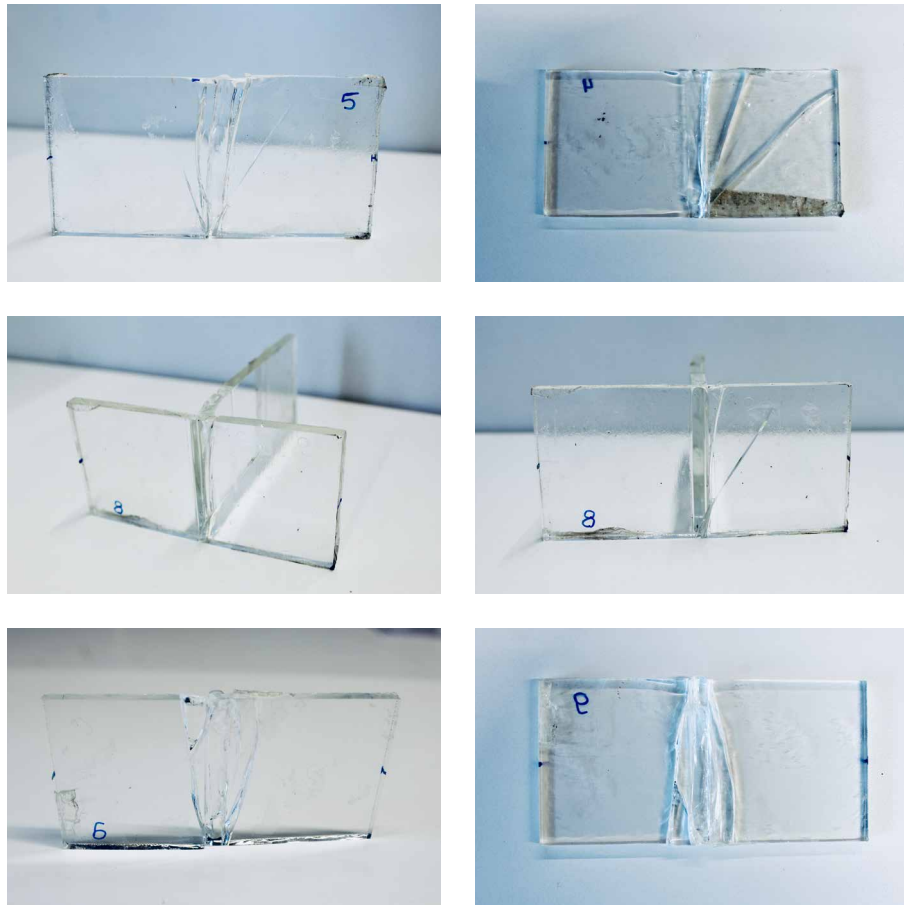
Fracture patterns for T-beam specimens showing breakage origin in joint
